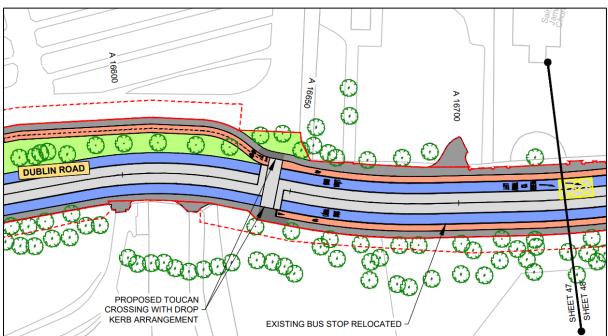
Extract from General Arragement Drawings at Beauchamp House (Sheet 47)
